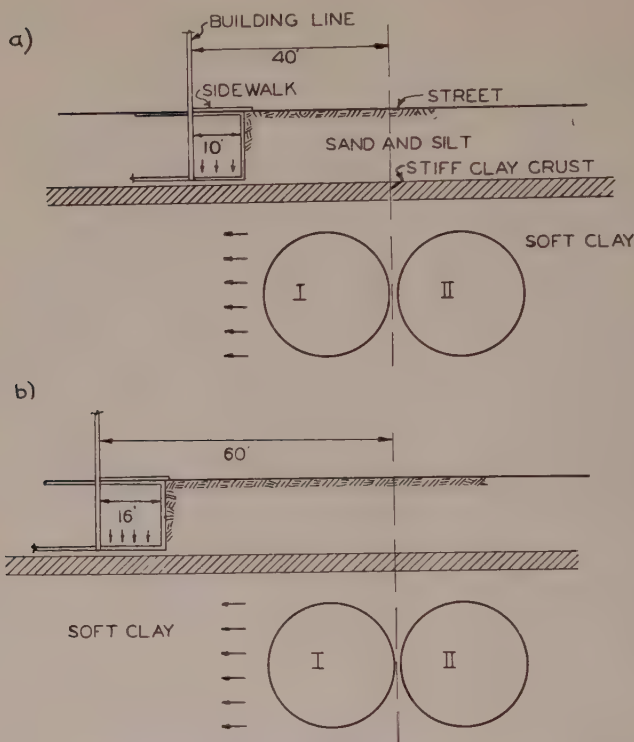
SIMPLIFIED SECTIONS THROUGH TUNNELS AND ADJOINING VAULTS
